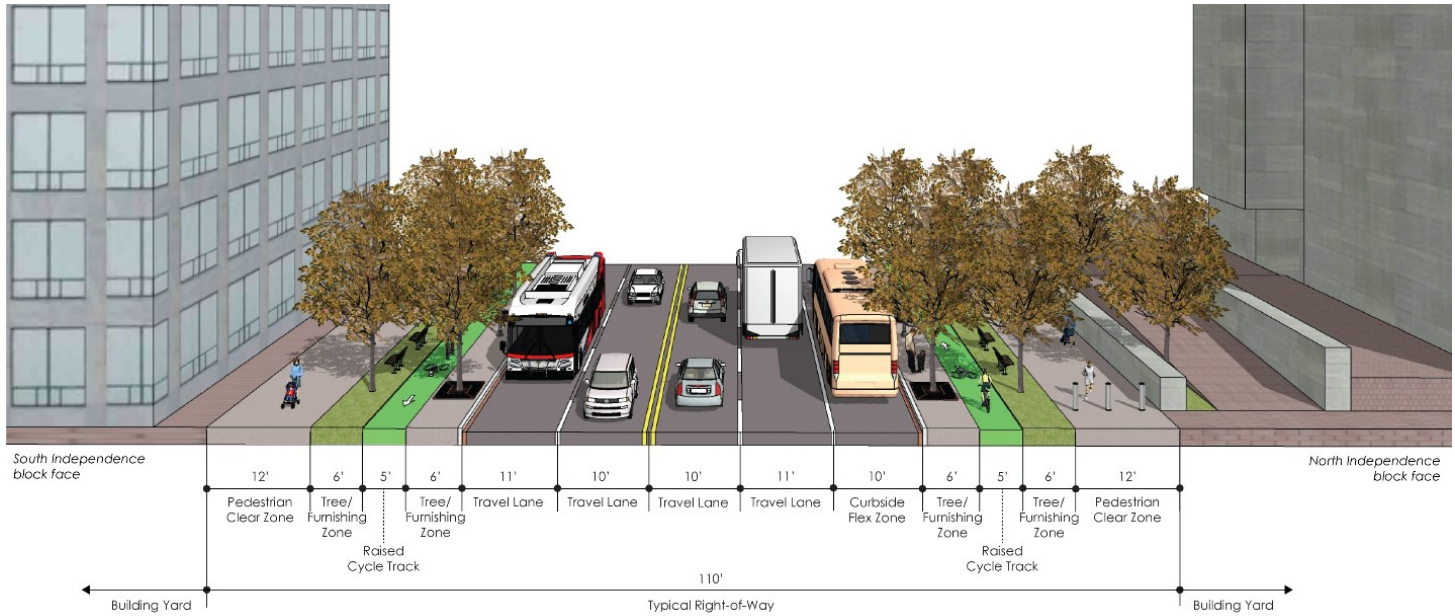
Typical Section for Concept 3 Raised Cycle Track
